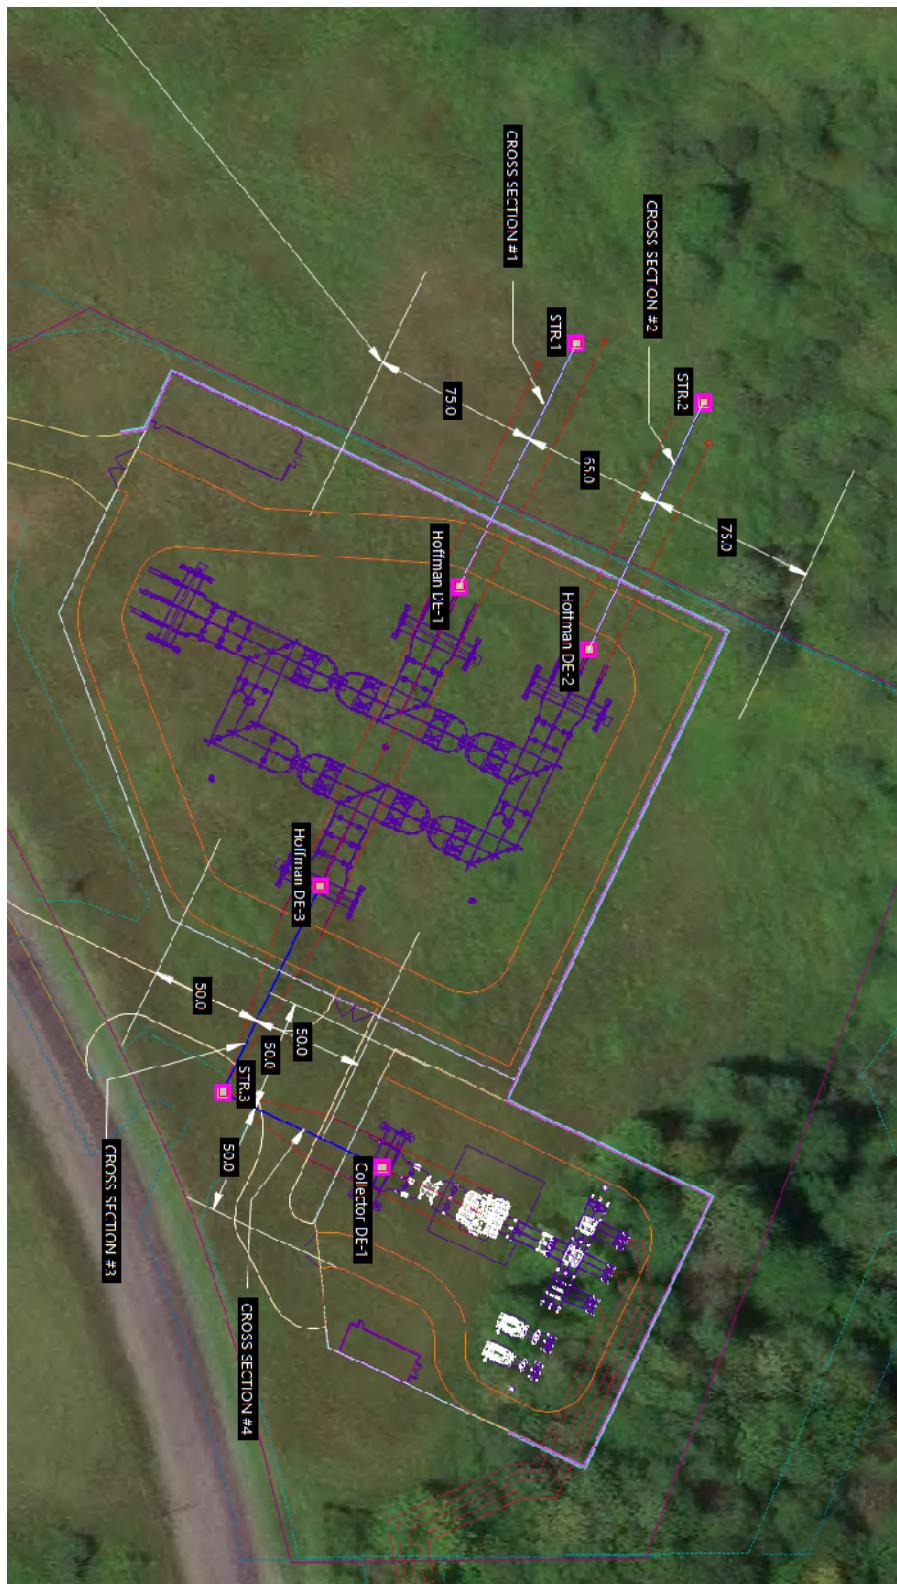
Aerial Imagery Showing plan View of all cross sections and proposed substation *All Dimensions shown are in feet
